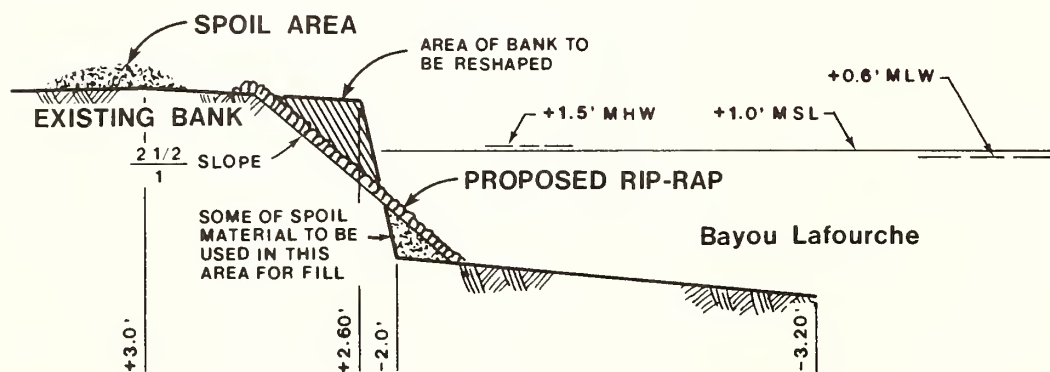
Proposed rip-rap at intersection of Bayou Lafourche and the flotation canal at the Port Fourchon facility.
